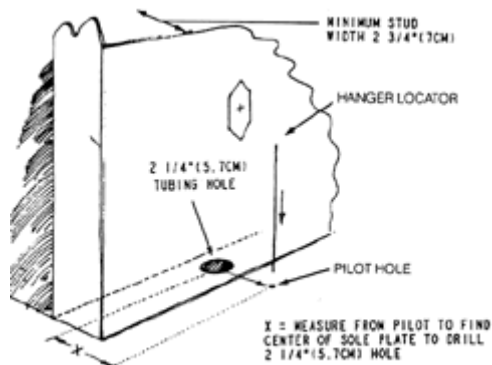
WALL INLET HOLES – EXISTING STRUCTURES
